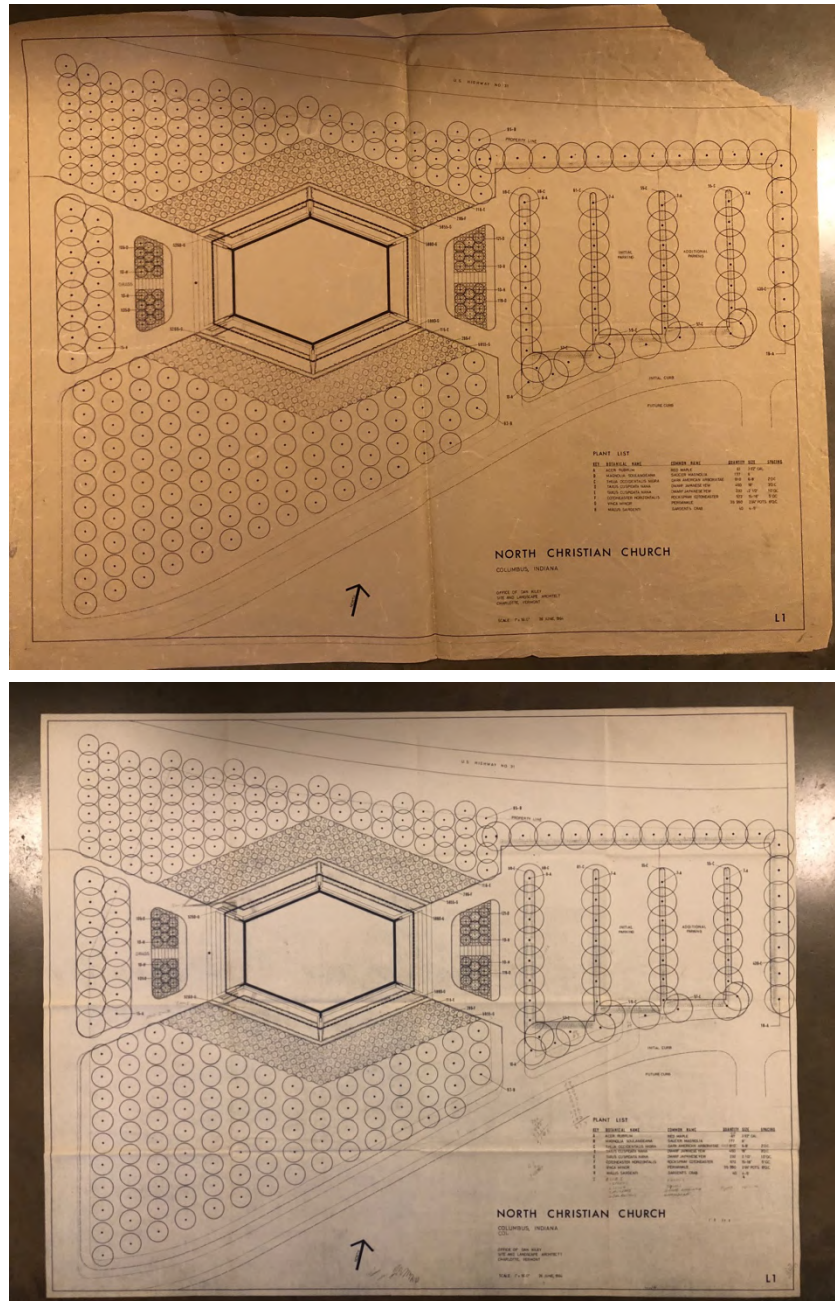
Dan Kiley and Partners, Site Plan, North Christian Church, 26 June 1964.
